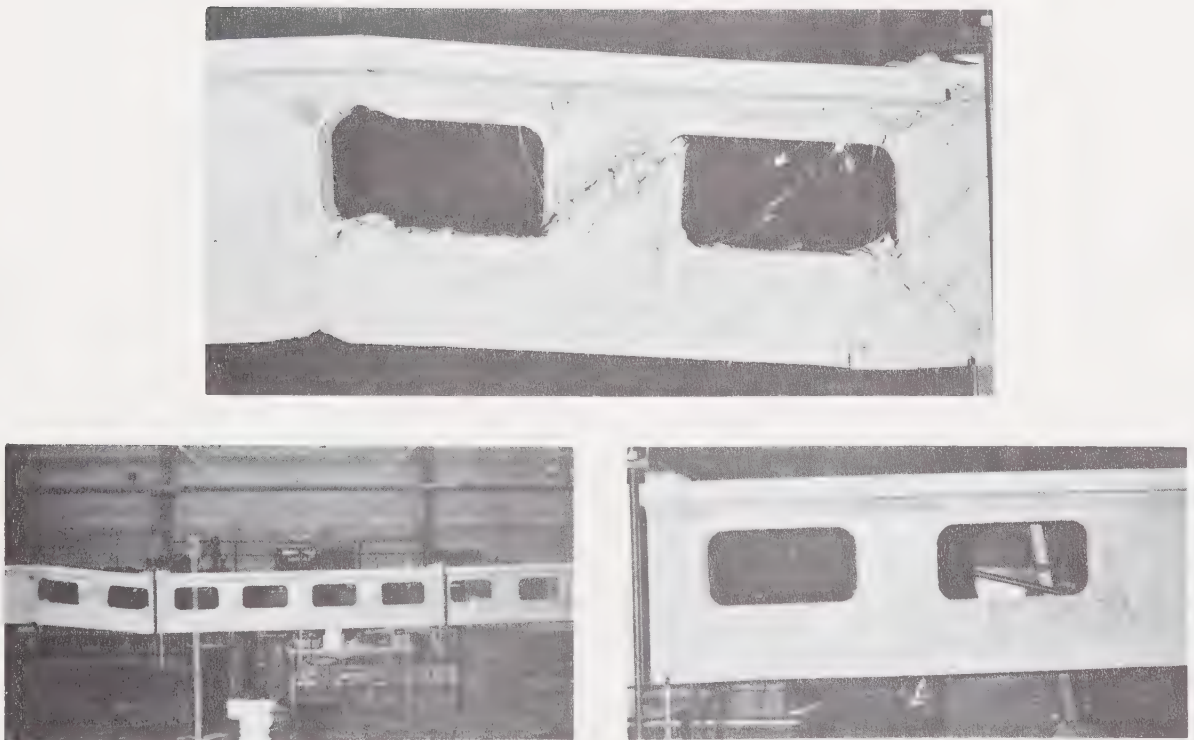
CRACKING AND FAILURE PATTERN OF BEAM 6-16-6
